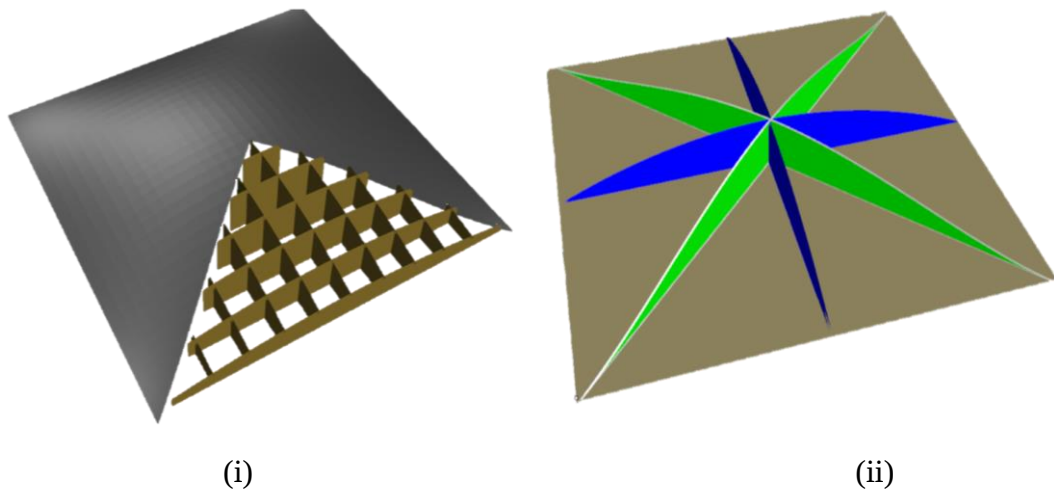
(i) Waffle type steel formwork & (ii) Plywood formwork
